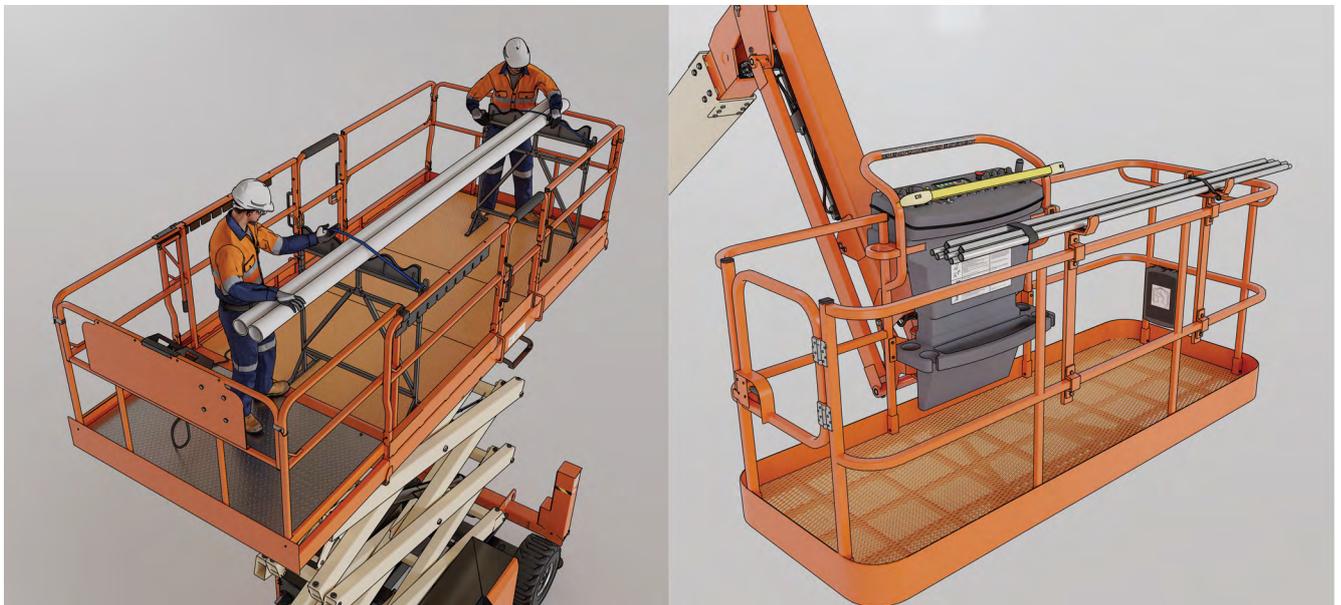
(a) and (b) – Examples of pipe racks fitted to EWPs
